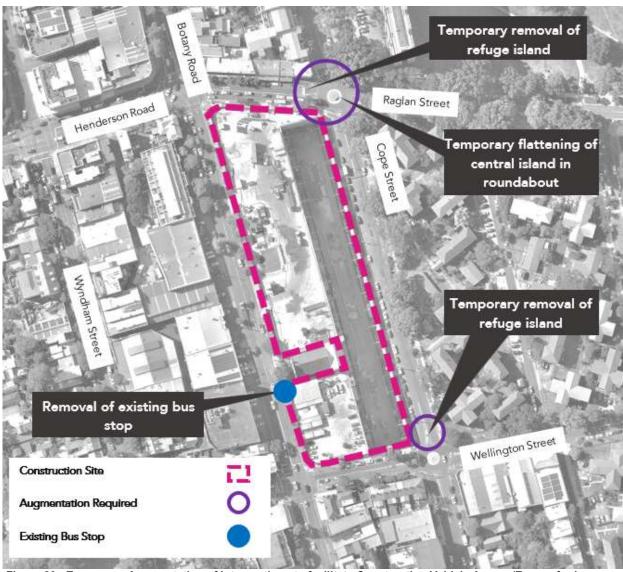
Temporary Augmentation of Intersections to facilitate Construction Vehicle Access/Egress for basement construction
